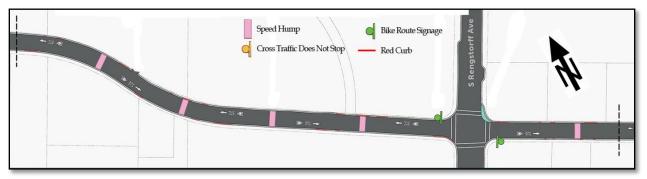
Ortega Avenue to Rengstorff Avenue Proposed Improvements
